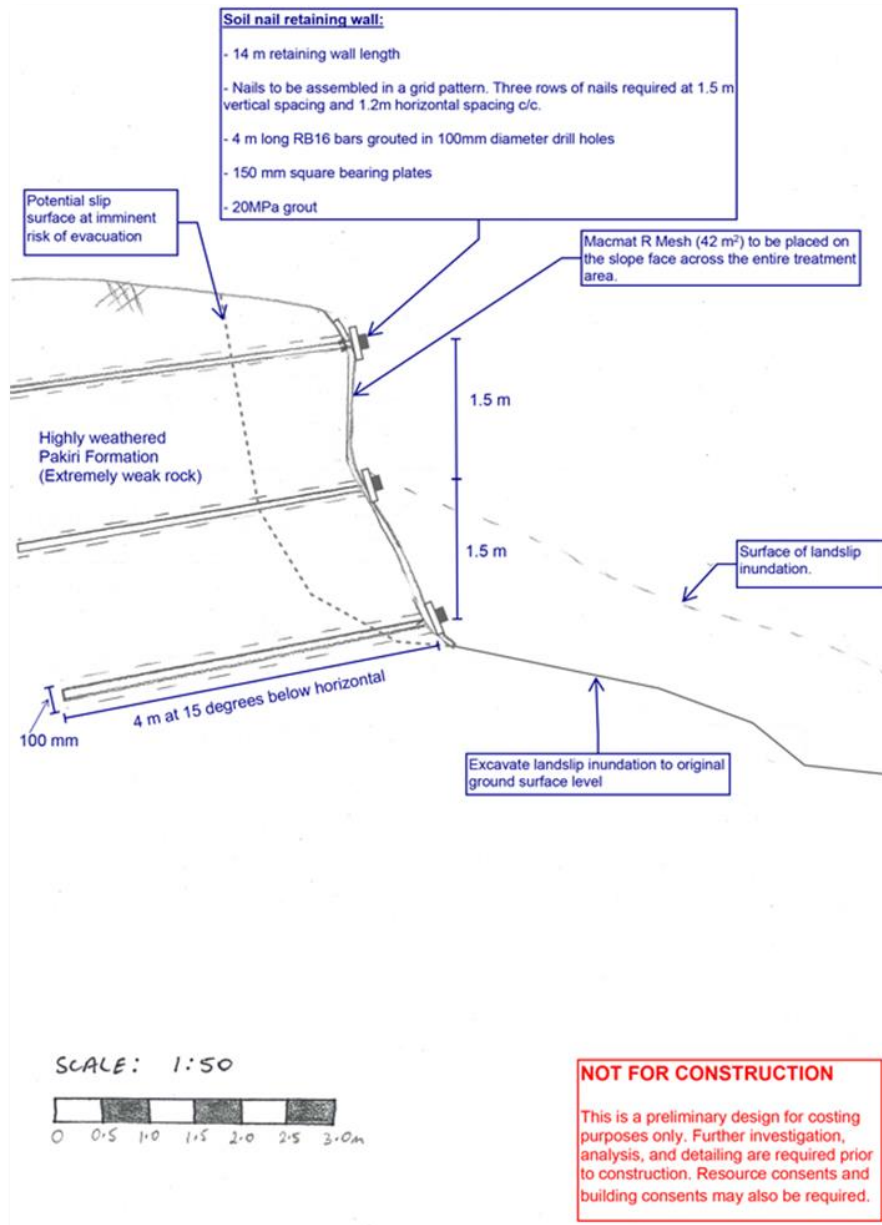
Key design elements of a nail/anchor retaining wall sketch
